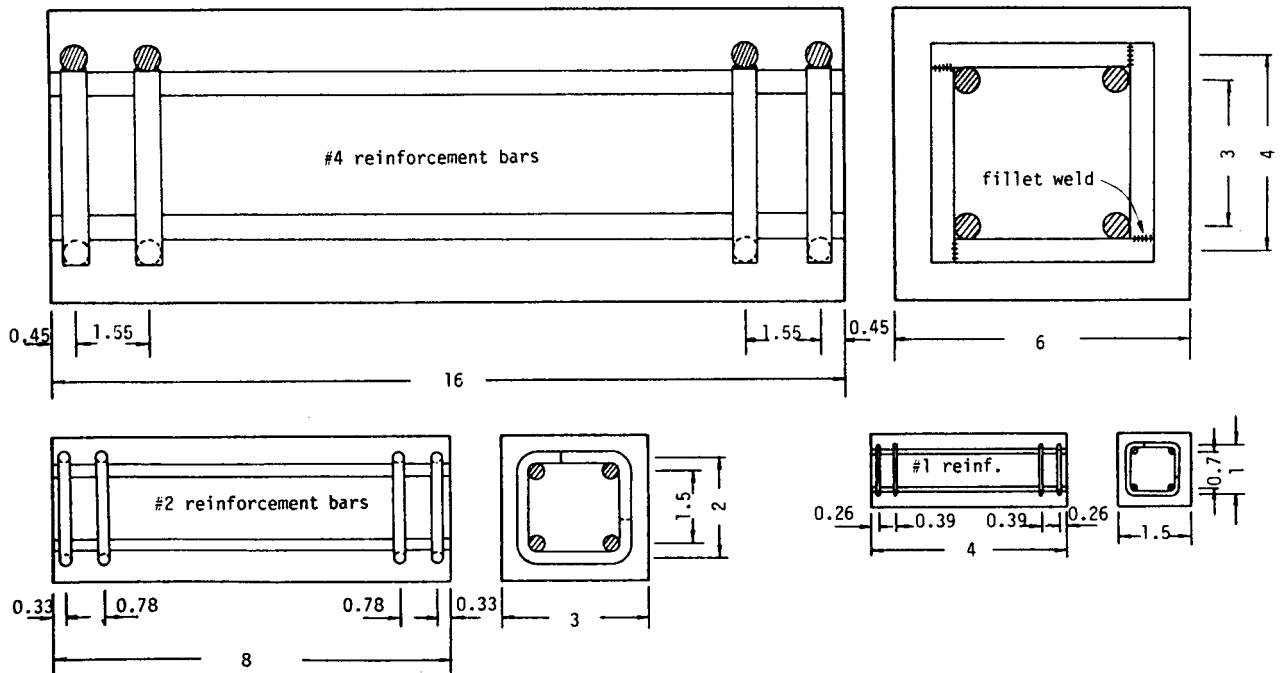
Reinforcement of the specimens (dimensions in inches; 1 in. = 25.4 mm).
